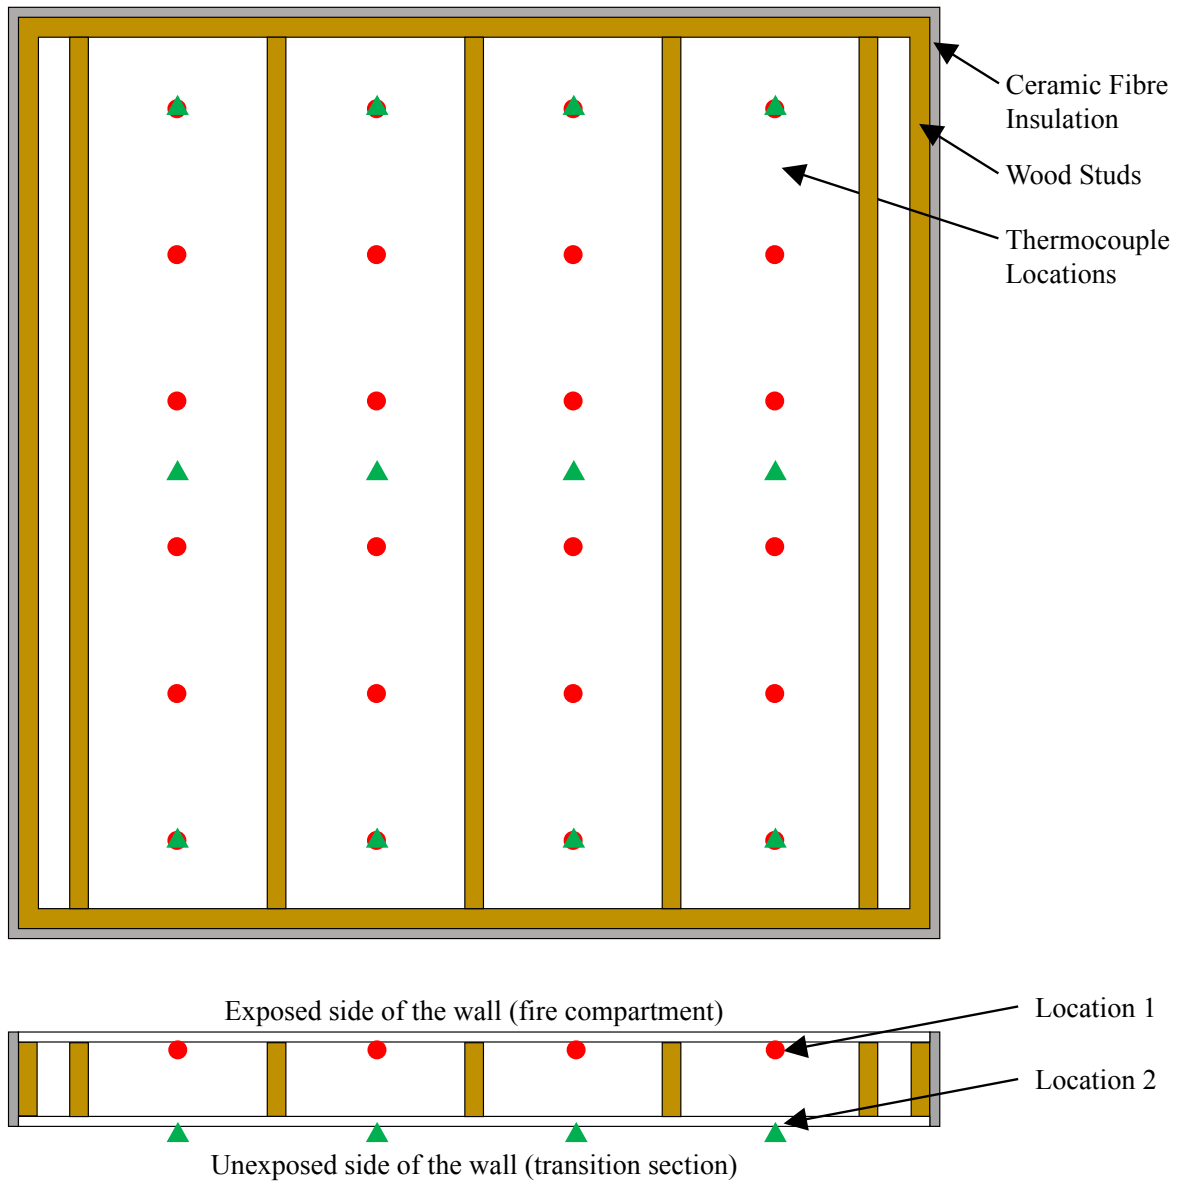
Thermocouple locations on a test wall with 16 in (406 mm) stud spacing.
